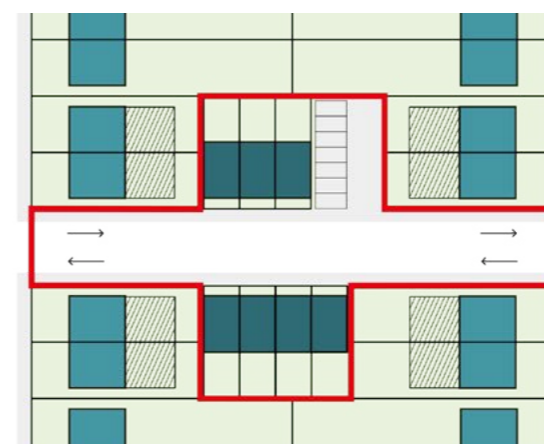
Plan diagram showing a new street-facing backland development site which provides footpaths and a vehicular route to an adoptable standard.
